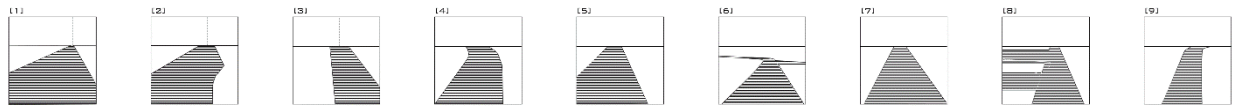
Road sections that formed landscape and views. (Džiaugys, 2024)
